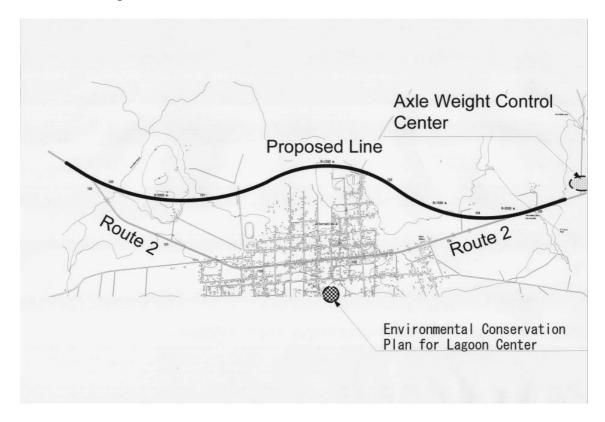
Construction Area of Vehicle Restriction and Planning Area
